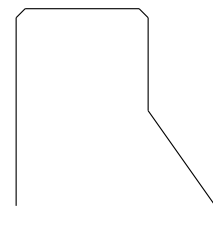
Ex Curb Sec 20 Cell (Barriers and Rails Library)
